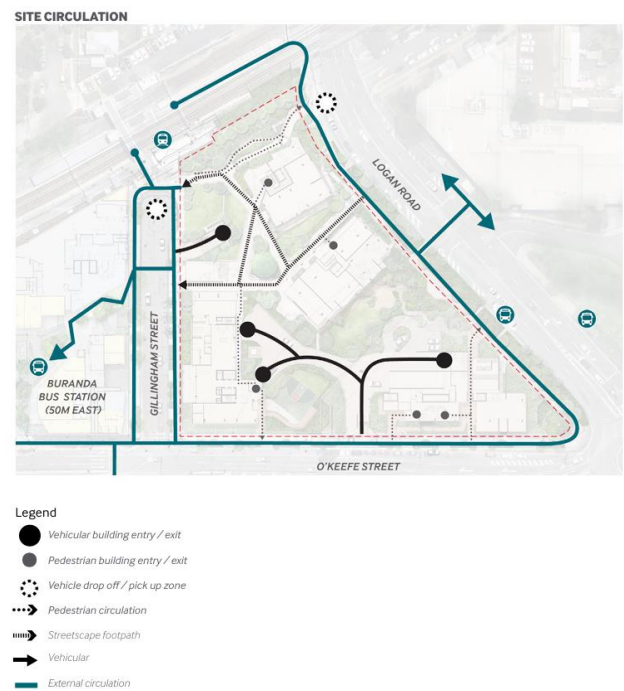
Landscape Concept Plan – Site Circulation
